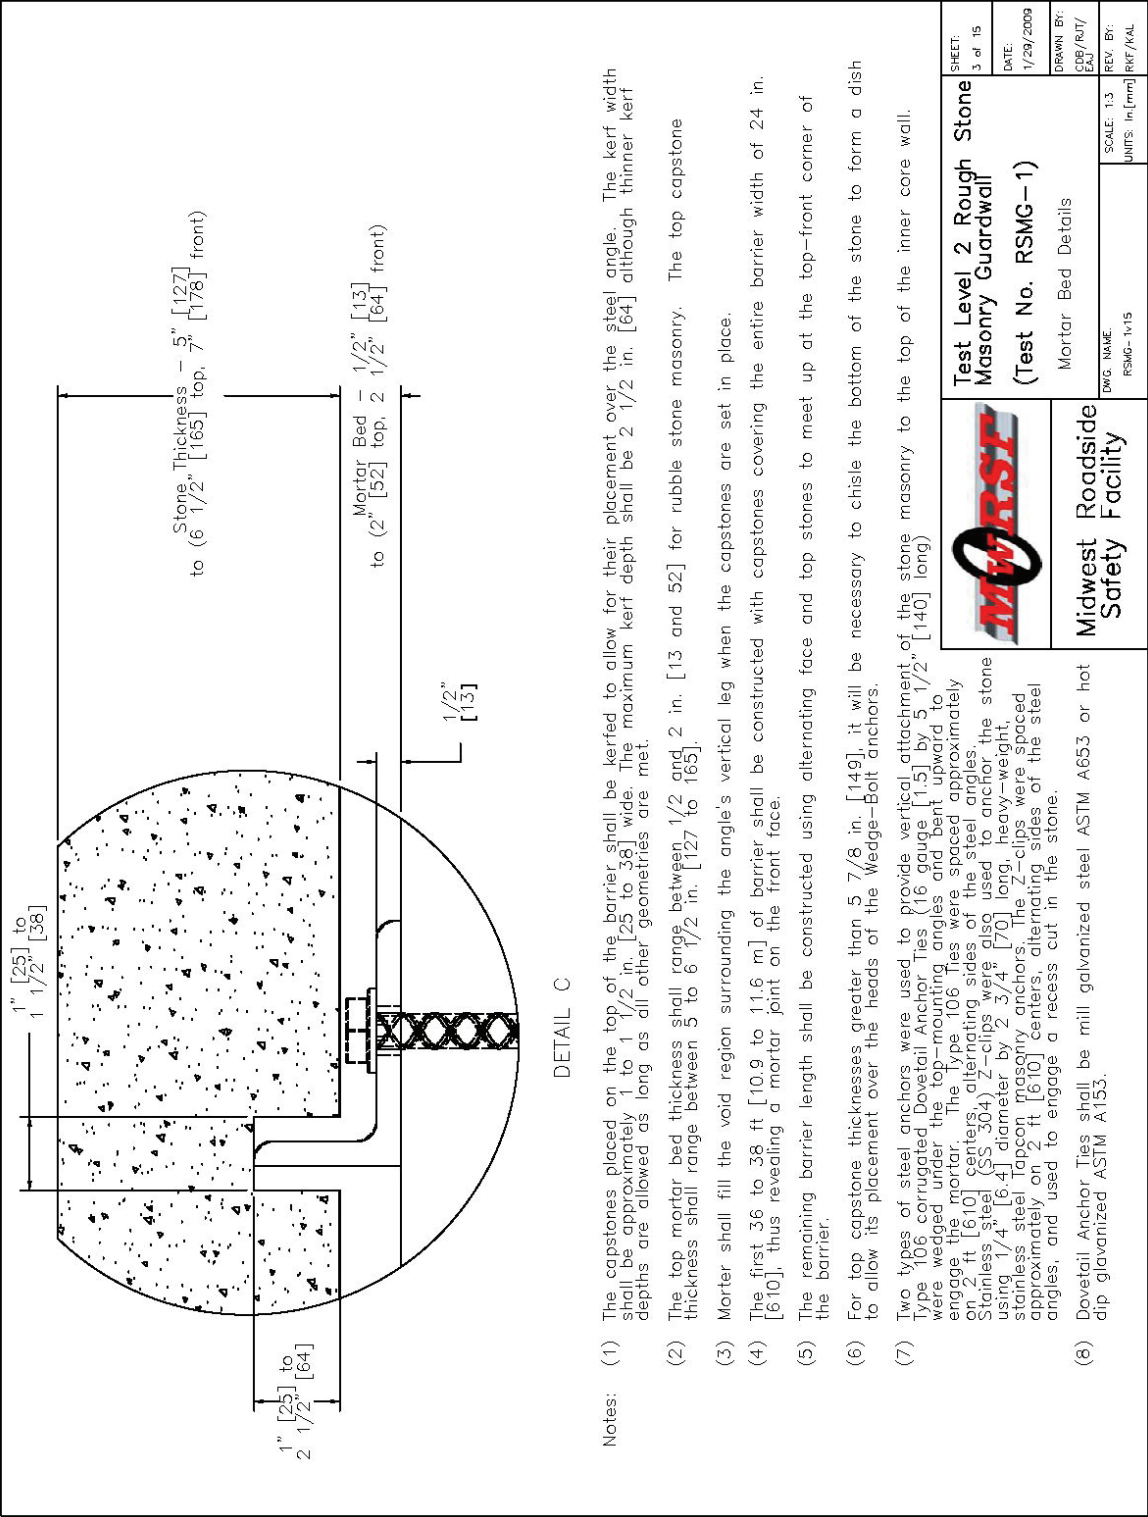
Mortar Bed and Stone Veneer Attachment Details, Test No. RSMG-I
